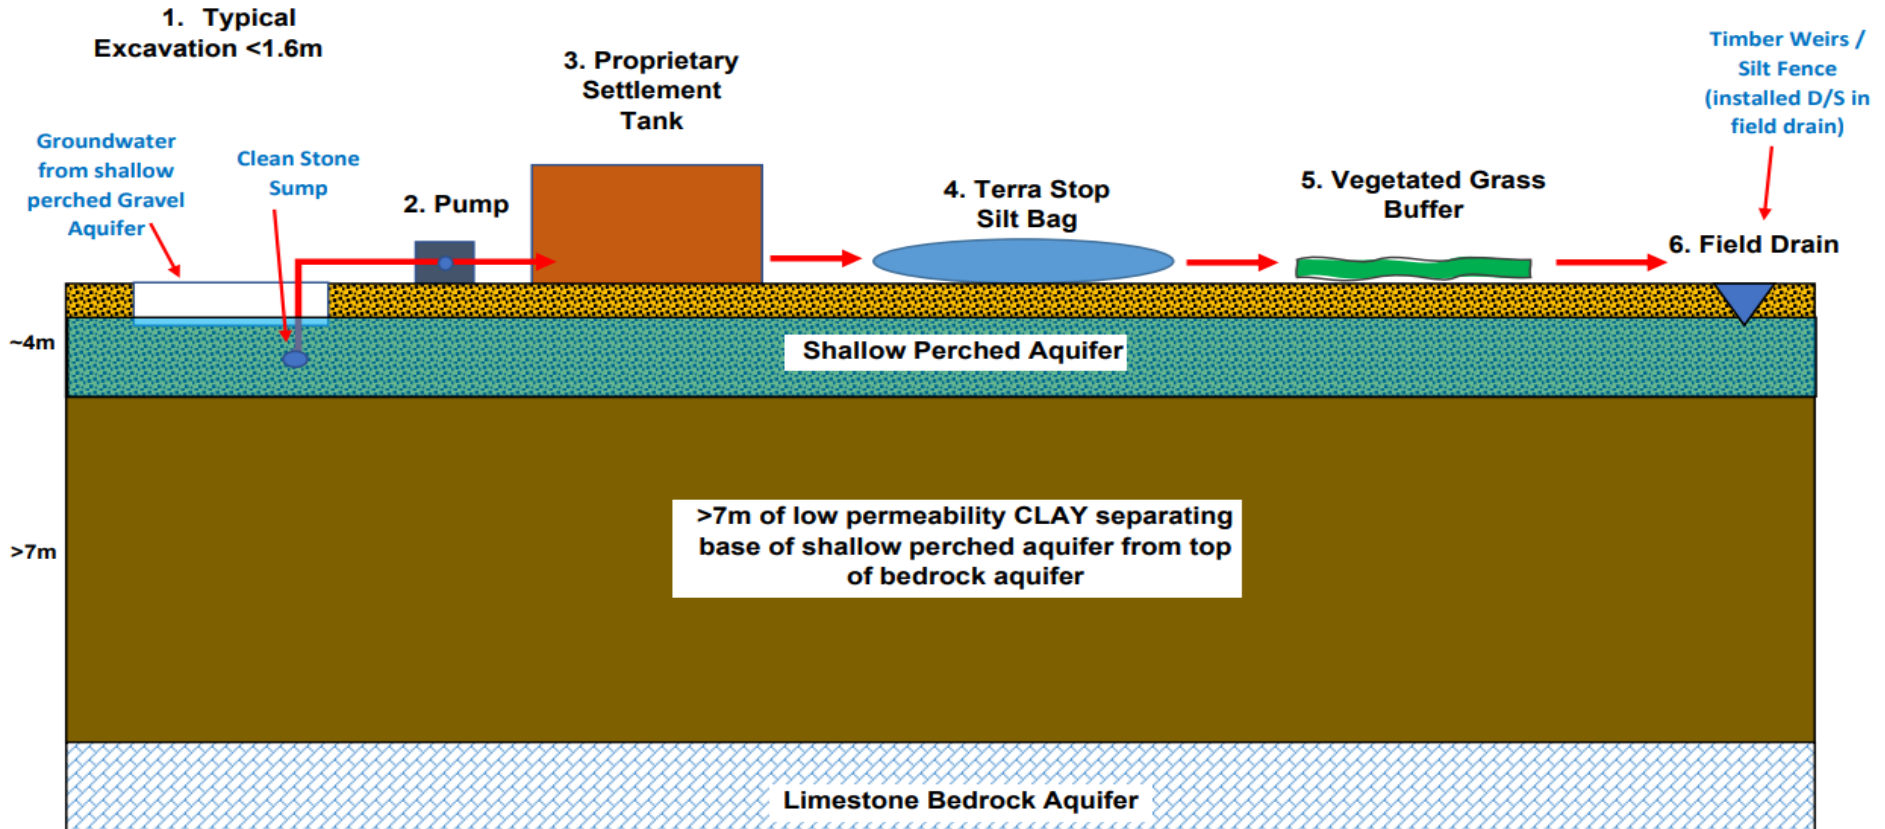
Dewatering Arrangement - Settlement Pond Construction
